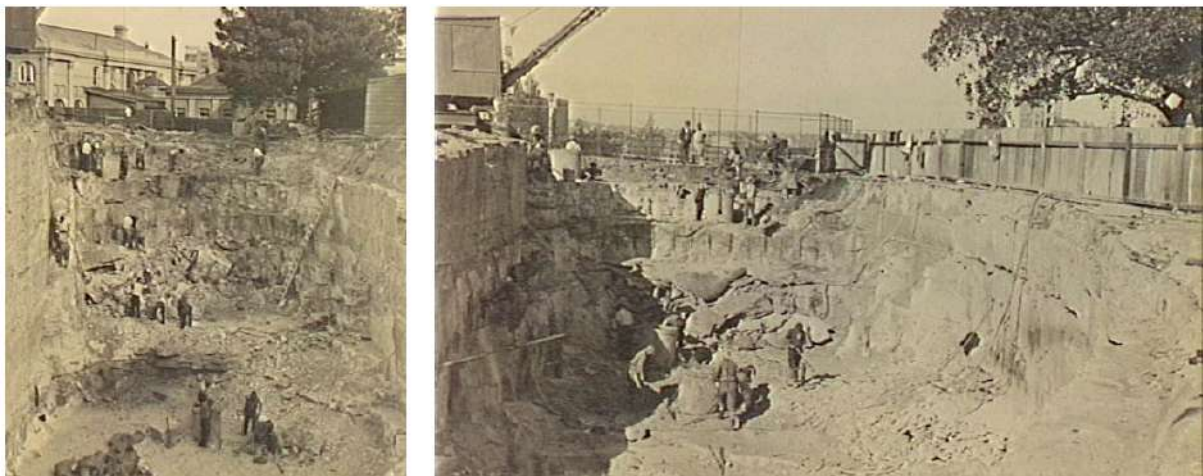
Excavating for the road loop looking south east, 22 May 1940 (left) and looking east, 4 September 1940. (Source: City of Sydney Archives NSCA CRS 66 2 18 and CRS 66 2 23.)
